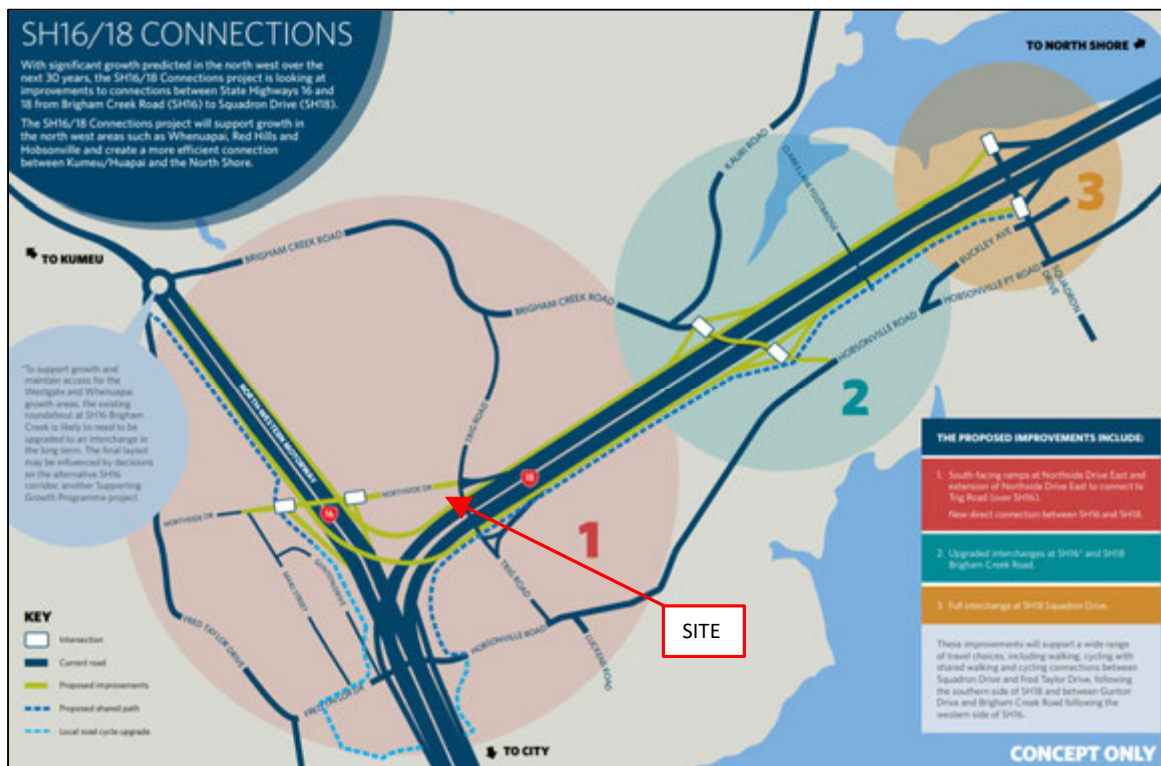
Waka Kotahi's Concept Northside Drive Extension to Trig Road
